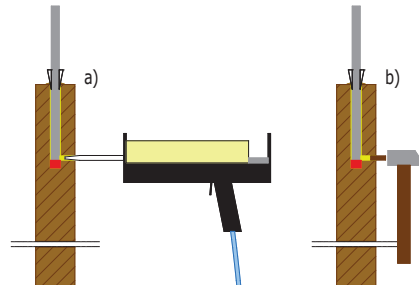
Preparation of test samples, a) gluing injection from the bottom of the bondline, b) closing of the injection hole with wood dowel
